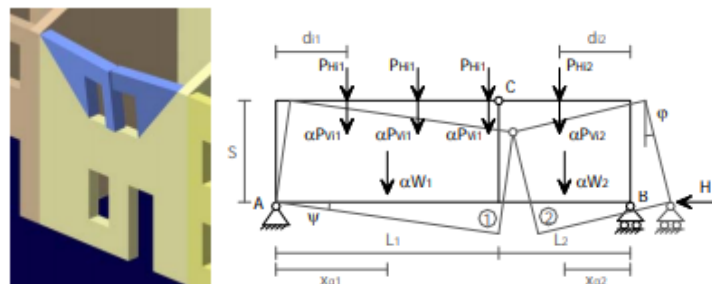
Horizontal wall flexion out-of-plane failure mechanism [112]
